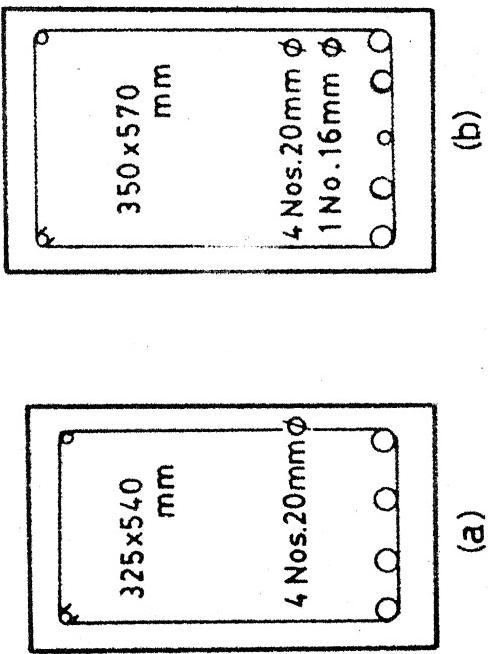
BEAM CROSS SECTIONS FOR EXAMPLE 4.2
